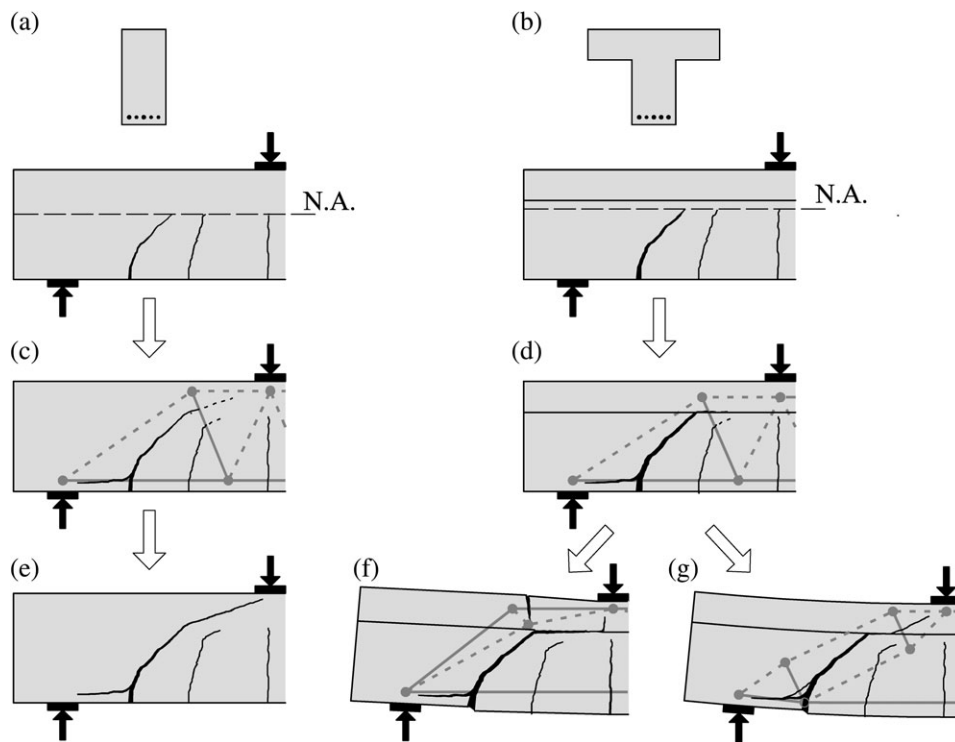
Critical shear crack pattern comparison between rectangular cross-section beams and a T-Beam: (a, b) flexural cracking, (c, d) development of inclined cracks, and (e-g) crack pattern at failure.
